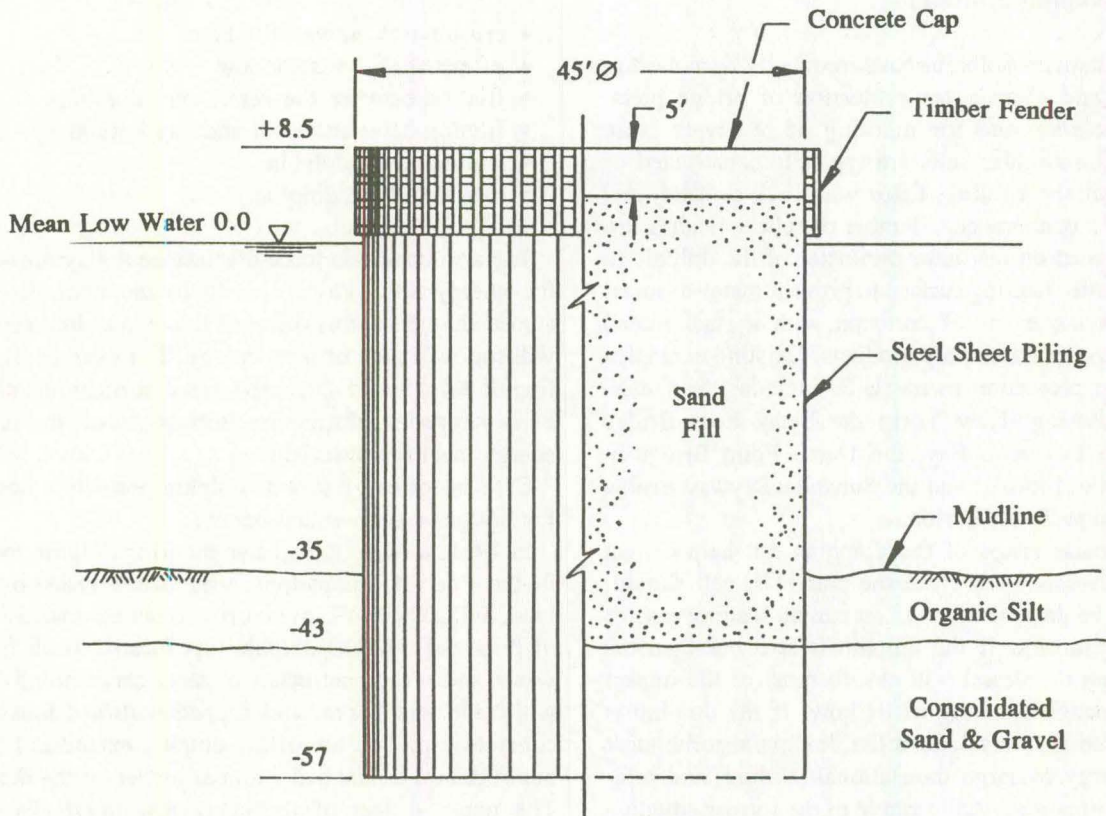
Typical Dolphin Protective Cell on the Outerbridge Crossing, New York, after [4].
